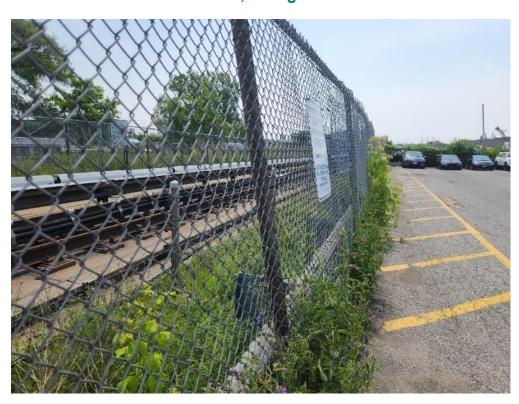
TTC existing Line 3 tracks between Ellesmere and Lawrence Stations, facing south.
